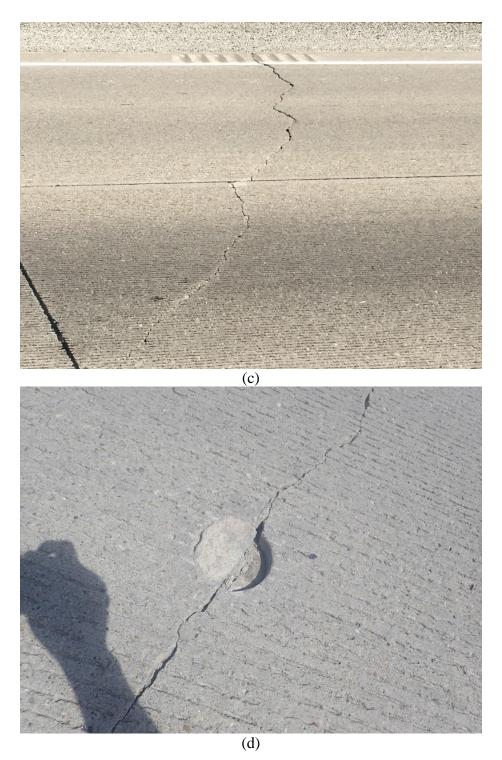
Pavement at LC Site 8 - IA 92 in Washington County
